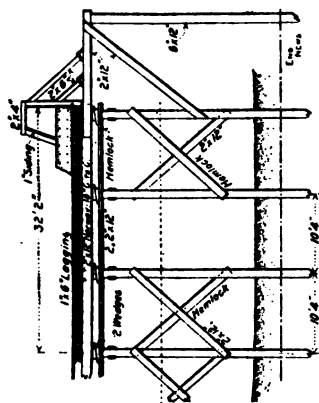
CENTER FOR SAN LEANDRO CONCRETE ARCH BRIDGE.
